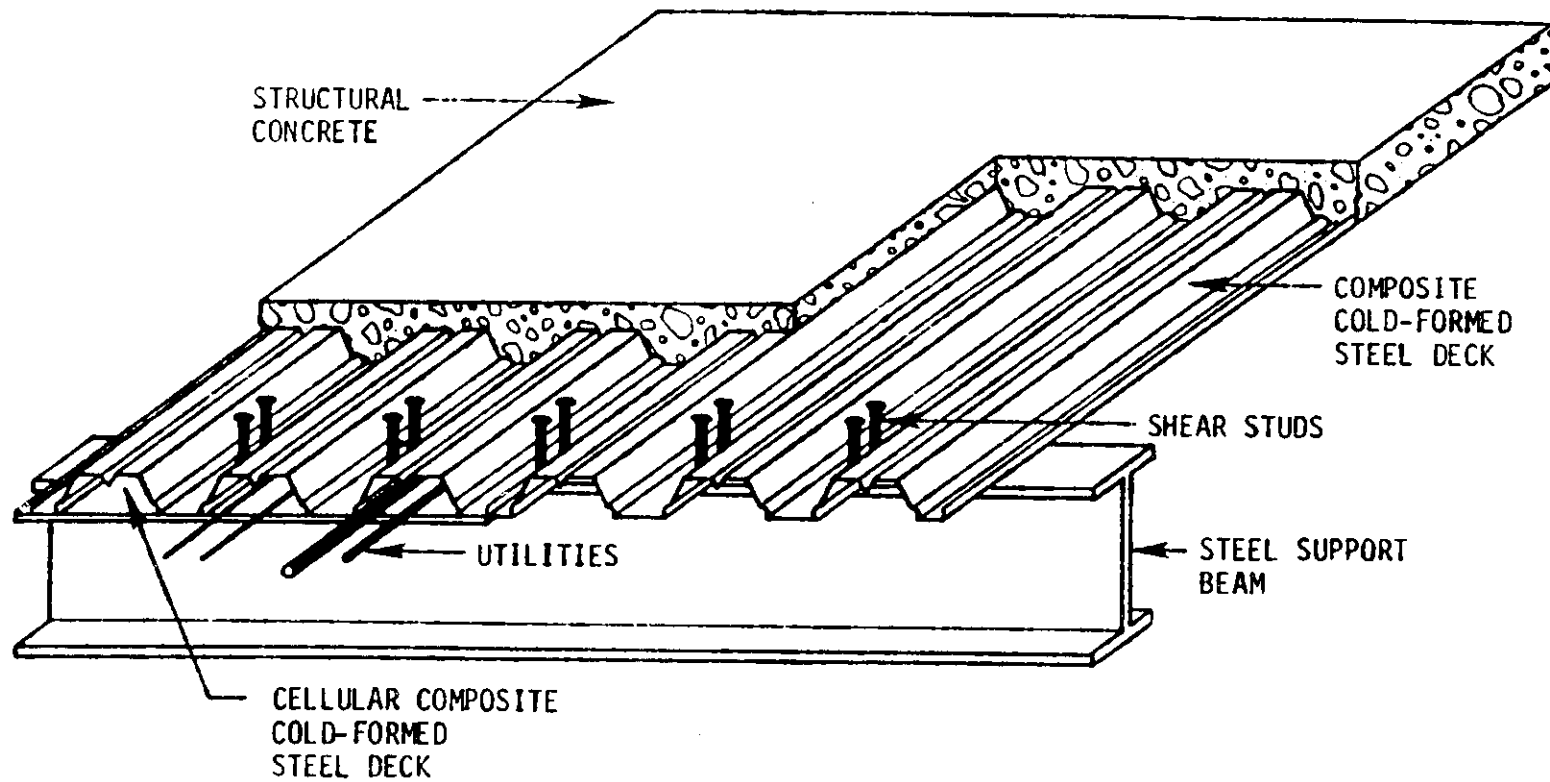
Typical building floor slab utilizing cold-formed steel decking
